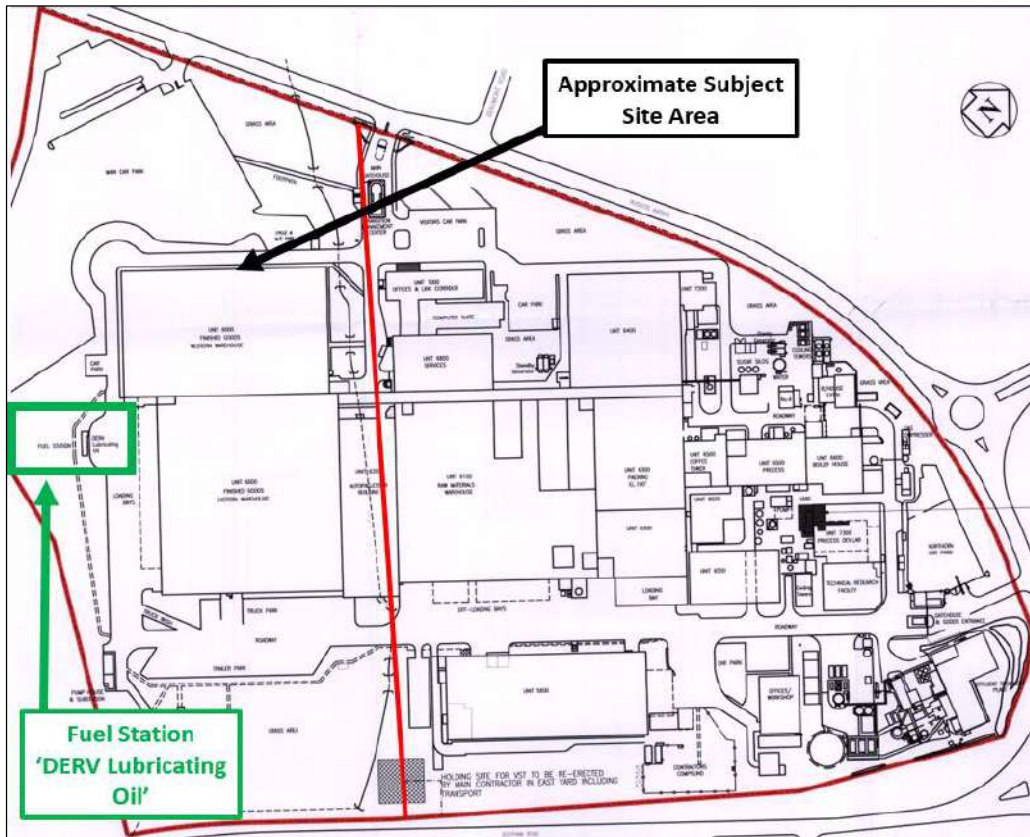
Former Subject (and adjacent larger Kraft) Site Layout
